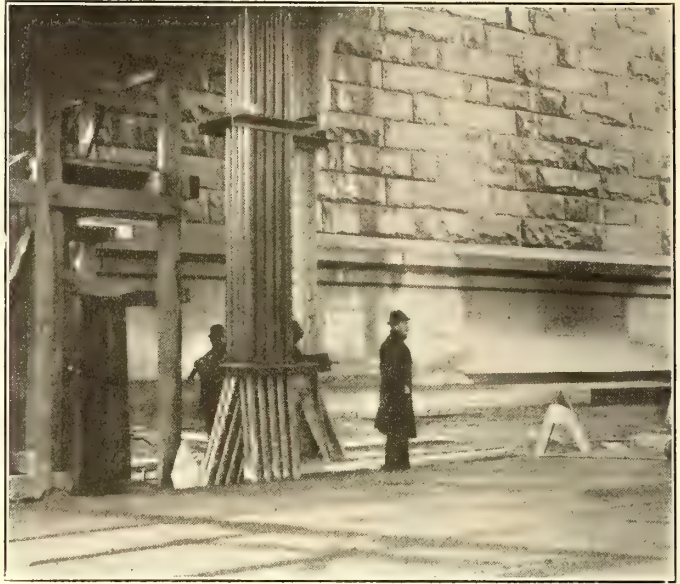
TWENTY OUTLET PIPES, RUNNING FROM MANHOLE UP PILLAR OF APPROACH TO NEW EAST RIVER BRIDGE
